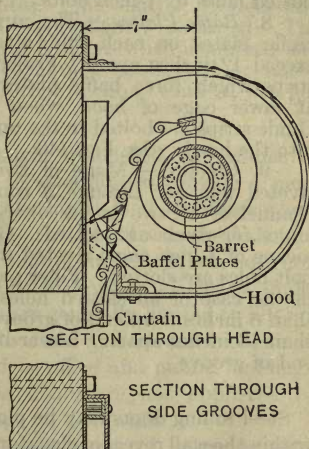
Detail of Hood and Coil, "Wilson Arrangement No. 1."
